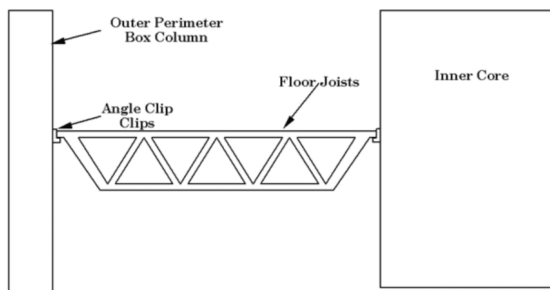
Structural scheme of the tower (Demonceau and Dewals, 2020).
